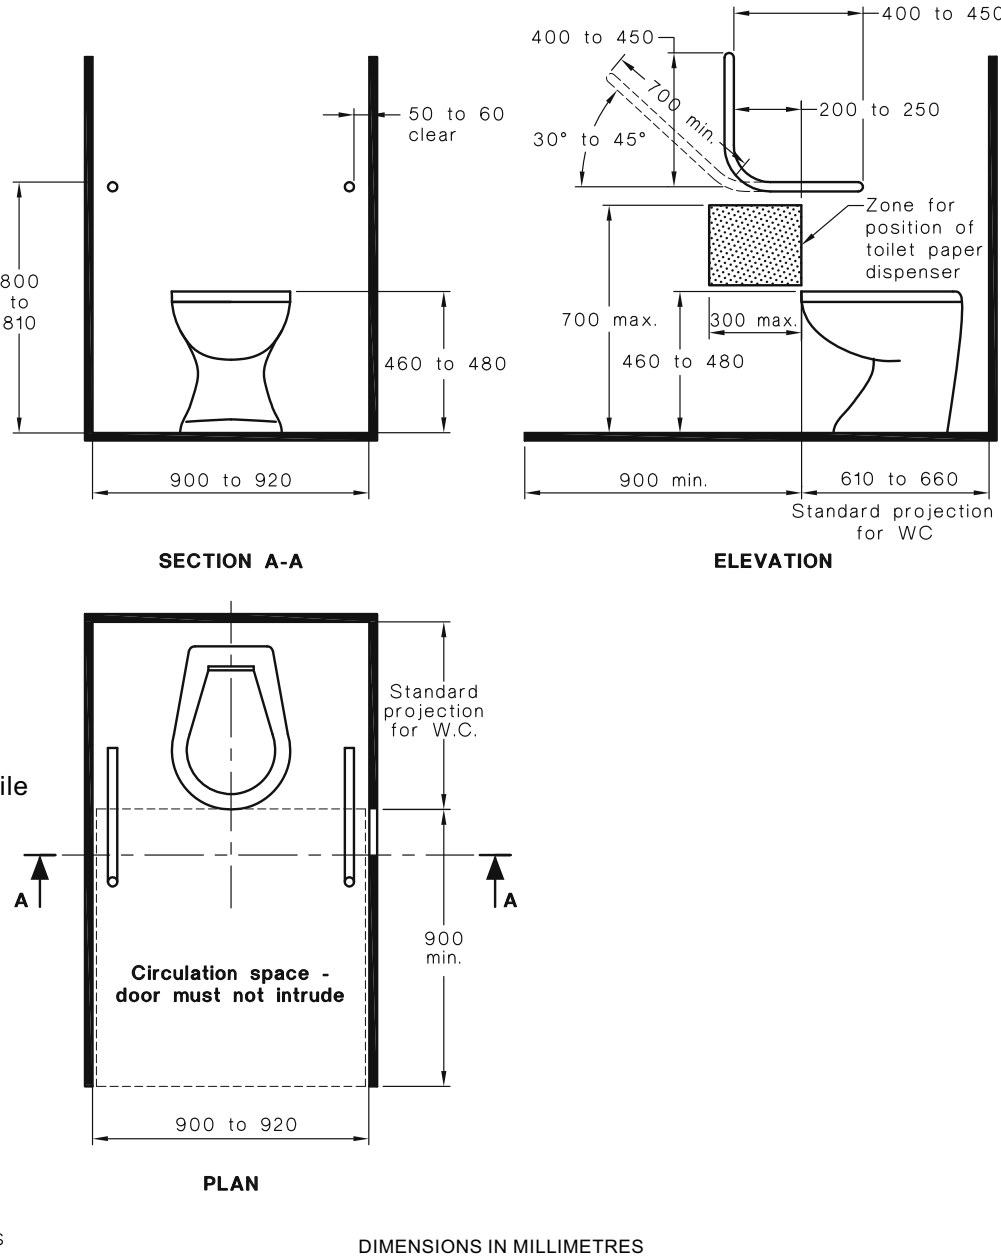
(A) SANITARY COMPARTMENT FOR PEOPLE WITH AMBULANT DISABILITIES—PLAN AND ELEVATION
